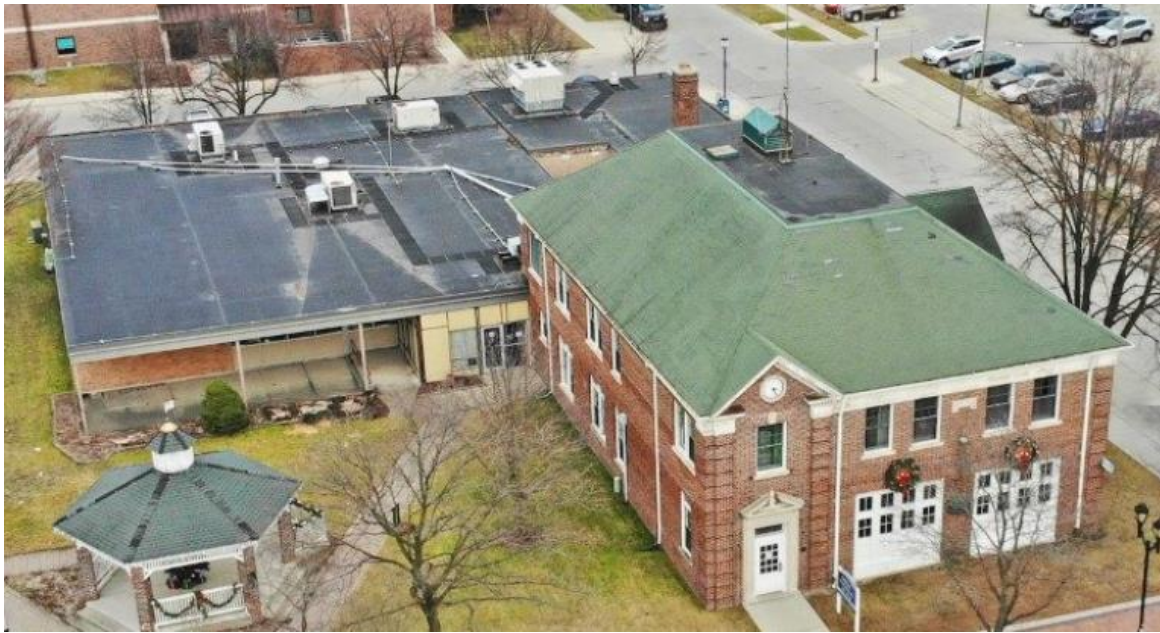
Aerial view showing an oblique view of the north and east elevations and the later addition to the western end of the building.
